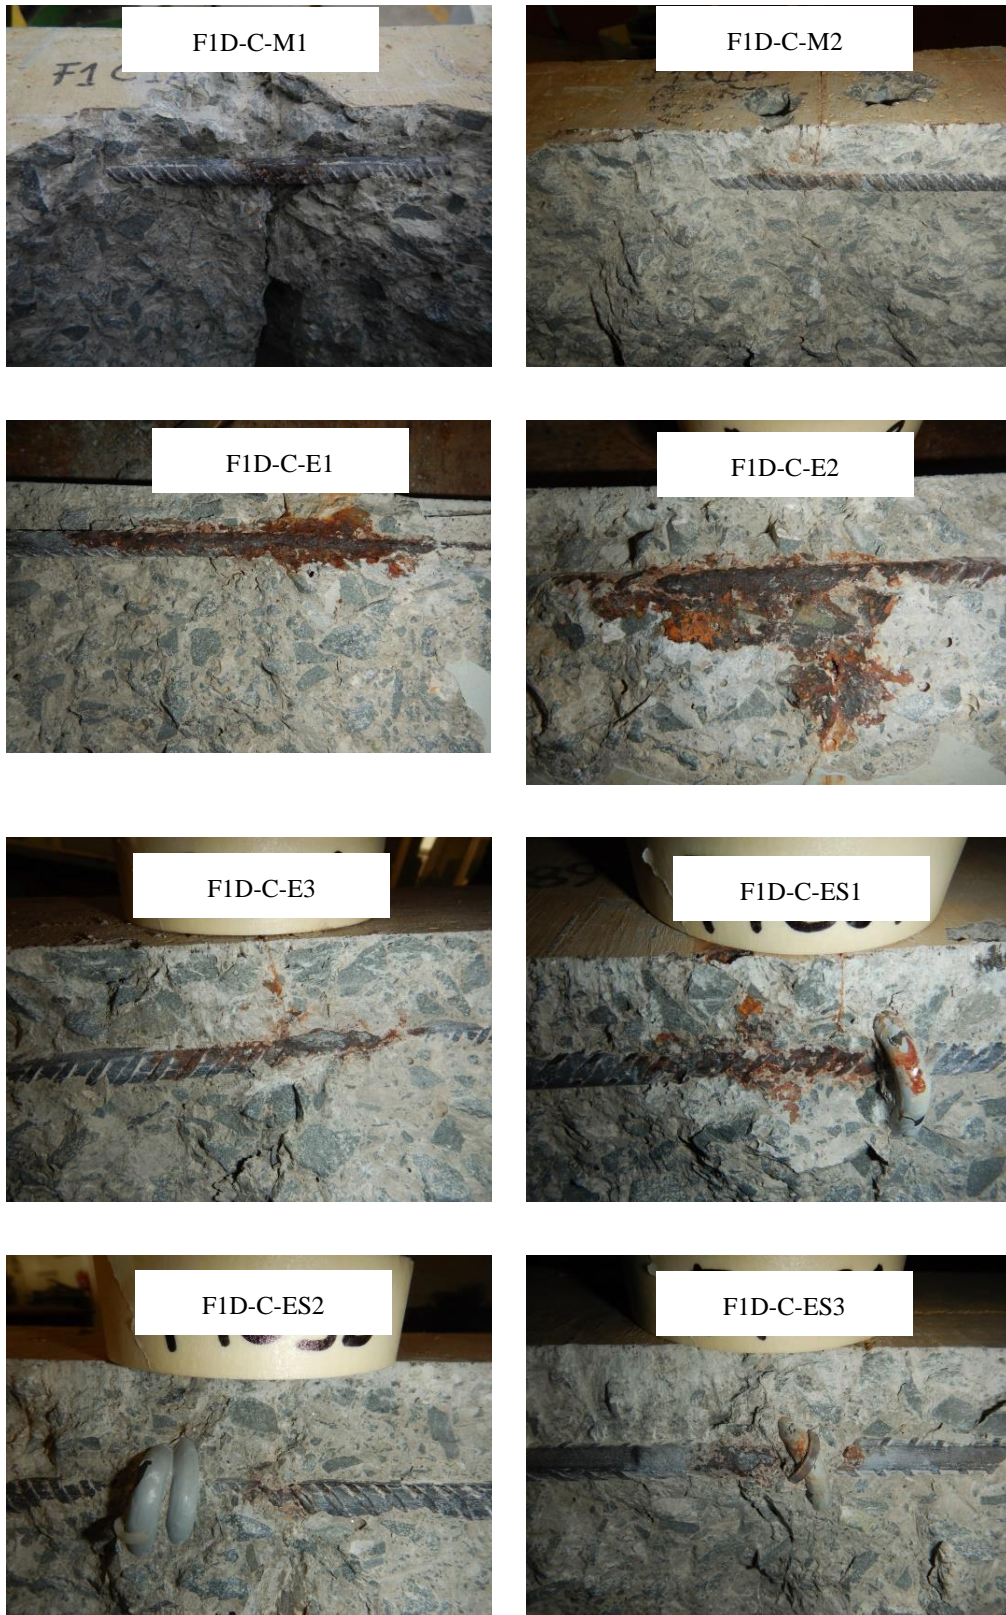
Photographs of corroded reinforcement bars in cracked PC/FA concrete
